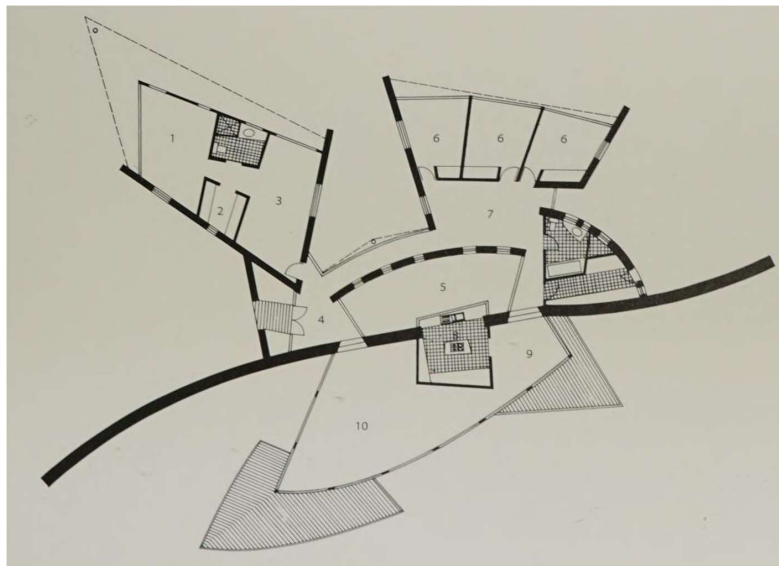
A floor plan of the Choong House. The numbers designate the following: 1 Master bedroom; 2 Dressing room; 3 Study; 4 Entry; 5 Courtyard; 6 Bedrooms; 7 Play area for children; 8 Kitchen; 9 Dining area; and 10 Living area. (Source: Jahn 1996:171)
